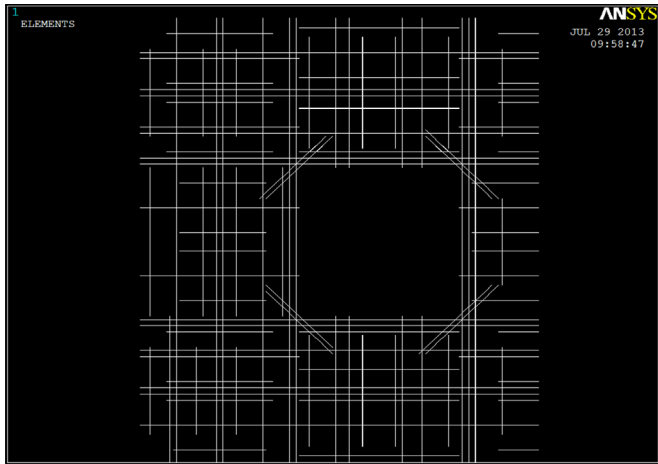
Strengthening the FE slab model with 25% opening by adding diagonal bars at opening corners.
